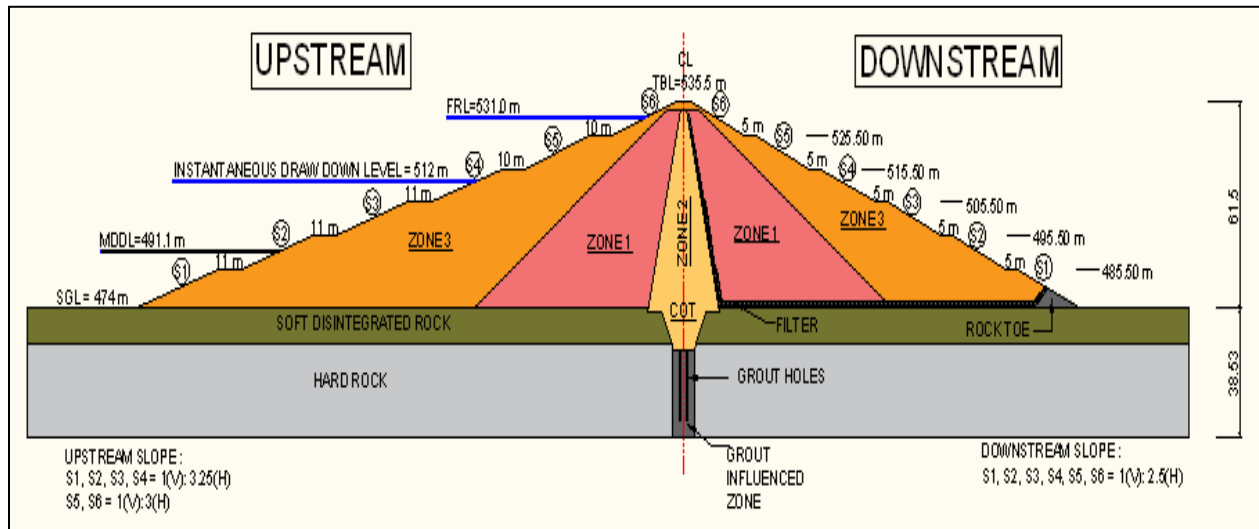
Design dam section 'II' of height 61.5 m at Ch. 3.7 km (maximum height)
